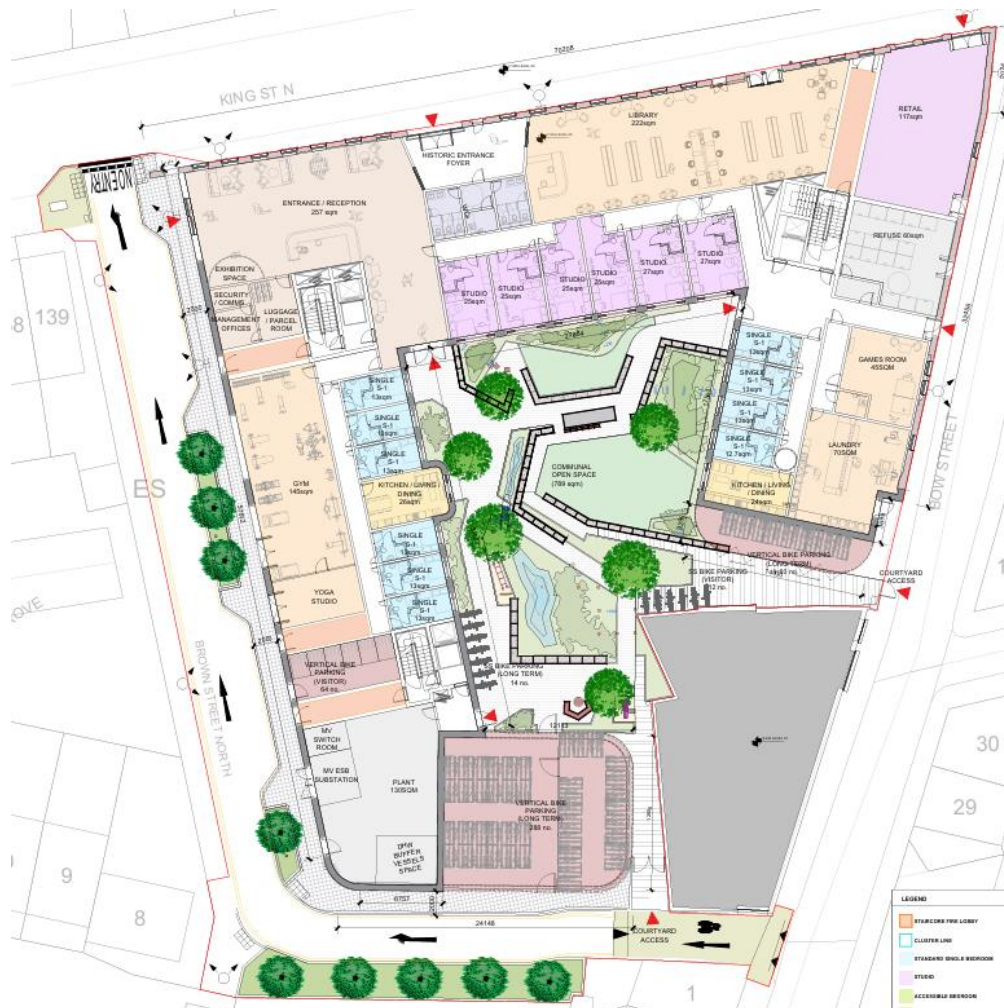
Proposed Site Layout Plan (MOLA Architects)
